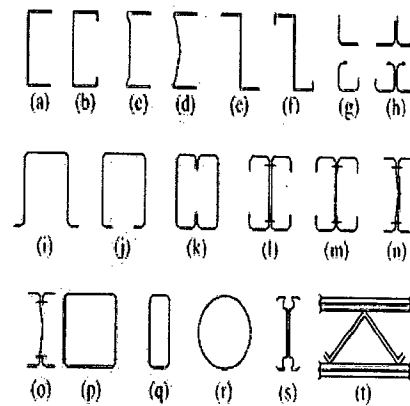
Cold-Formed Steel Sections used for Structural Framing. (From Yu, W.W. 1991. Cold Formed Steel Design, John Wiley & Sons, New York.)
